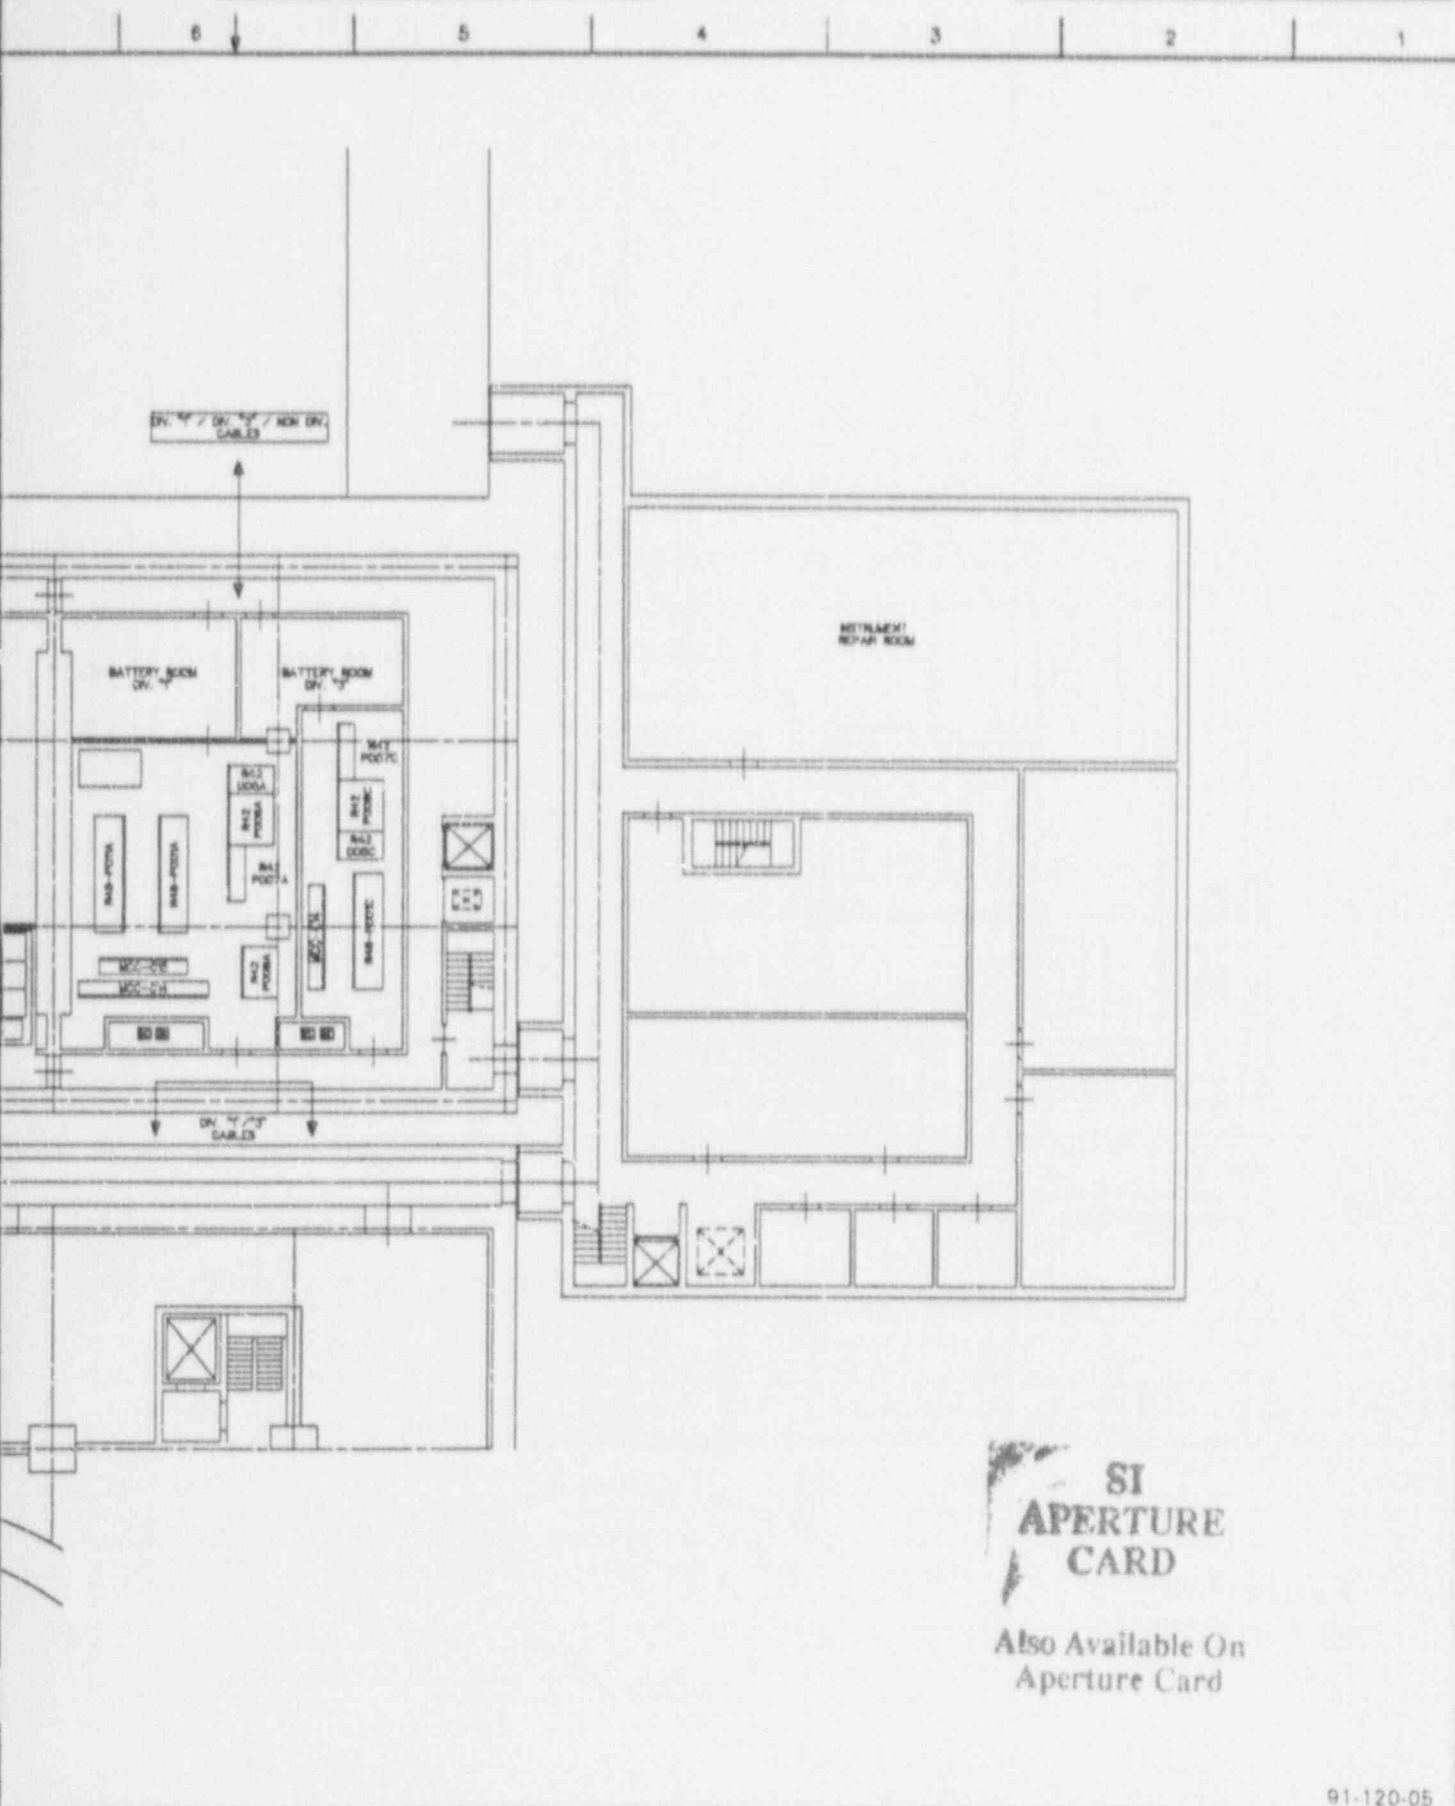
CONTROL AND SERVICE BUILDING, ARRANGEMENT
